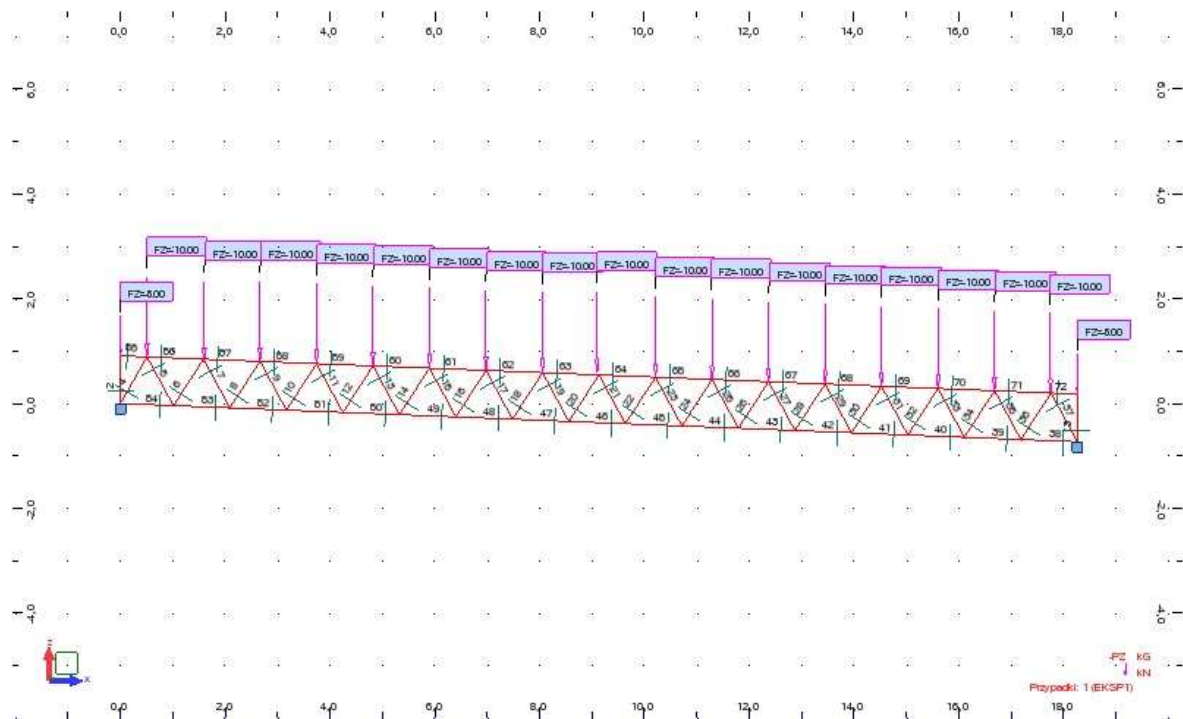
Truss with changed shape and IPN cross-sections.
